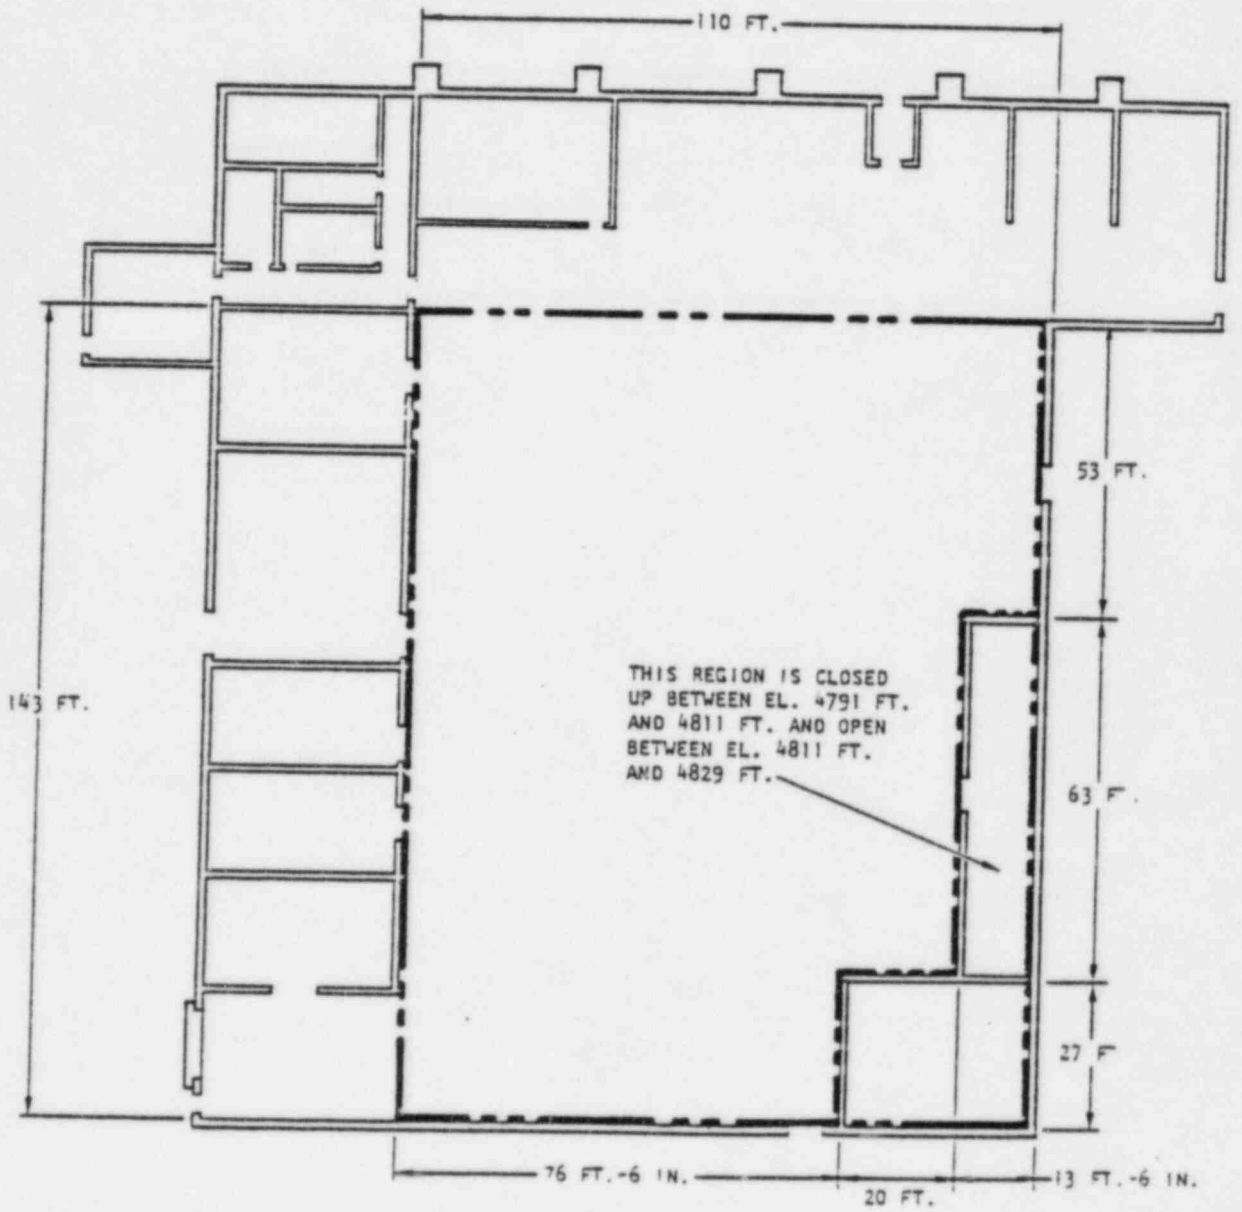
Turbine building plan view at elevation 4791 ft showing region of analysis
